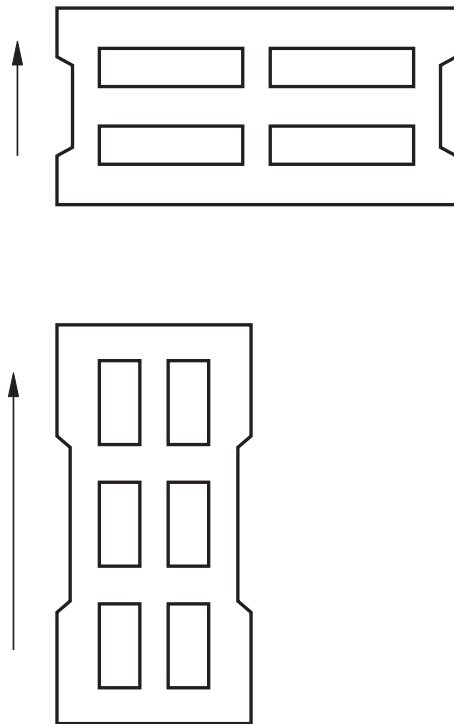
Lightweight concrete masonry units — Geometry 0,8/x
